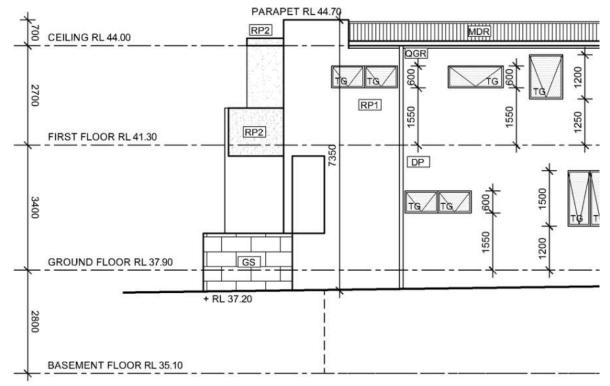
Extract of the east elevation of the proposed dwelling house (source: N Lycenko Architect, dated May 2020)
